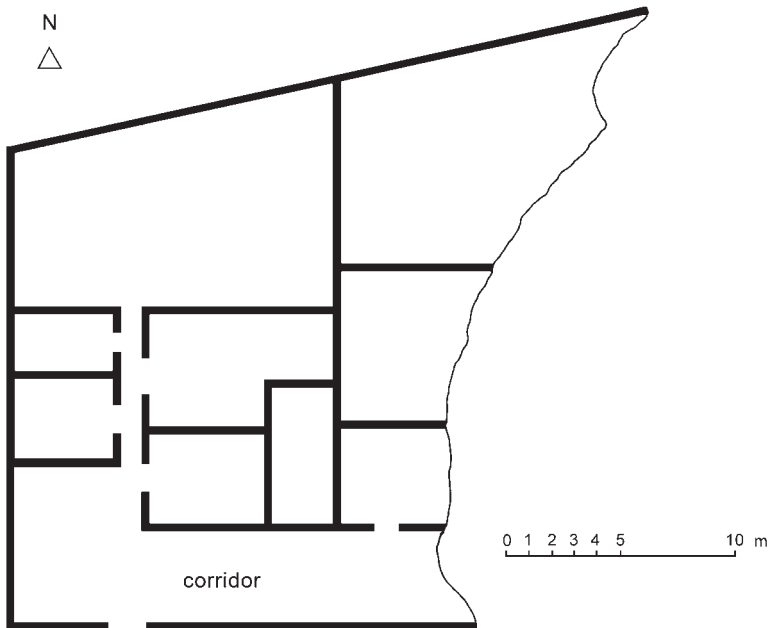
Plan of the villa of Villaverde Bajo (M) (after Pérez de Barradas 1931–2).
